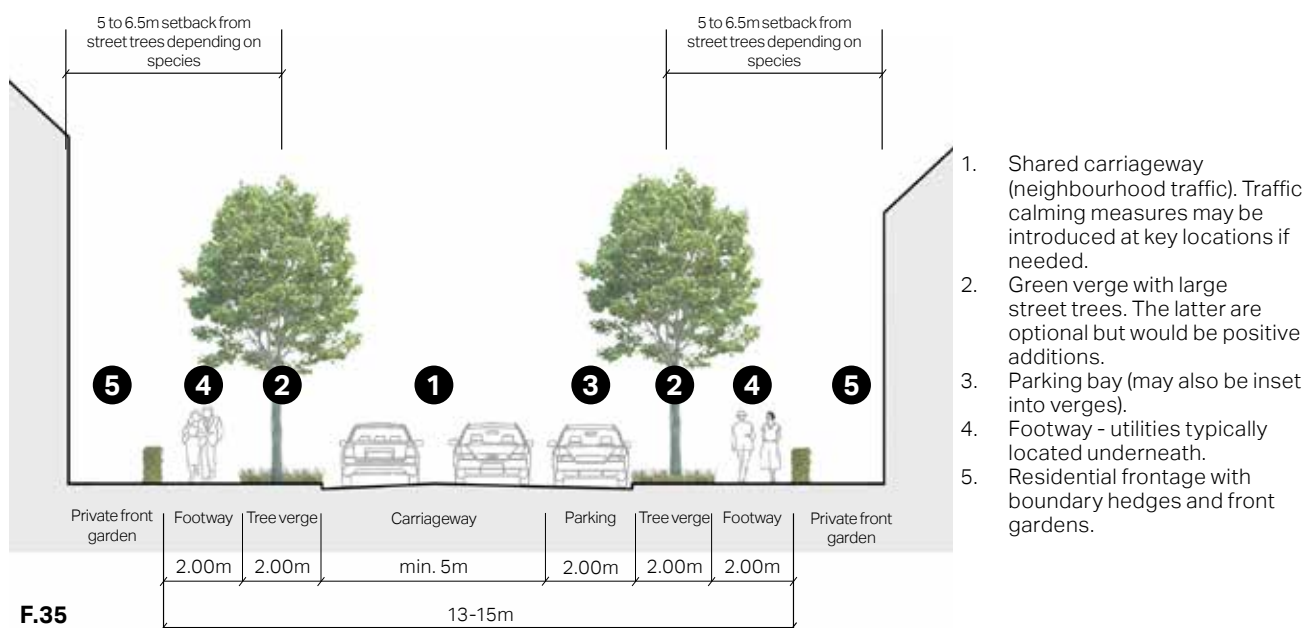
Cross-section to illustrate some guidelines for a Residential Street Type 1.
